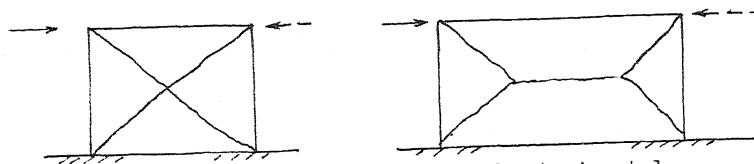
Cracks on brick walls under horizontal earthquake actions
